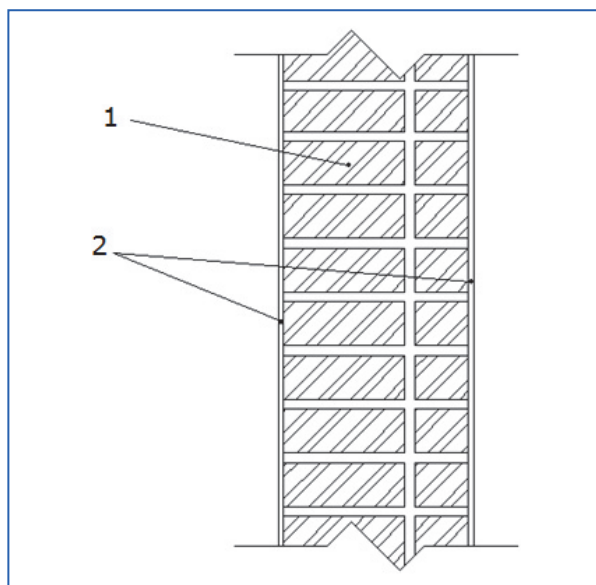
Wall. 1) 380 mm ceramic or silicate brick; 2) finishing.
